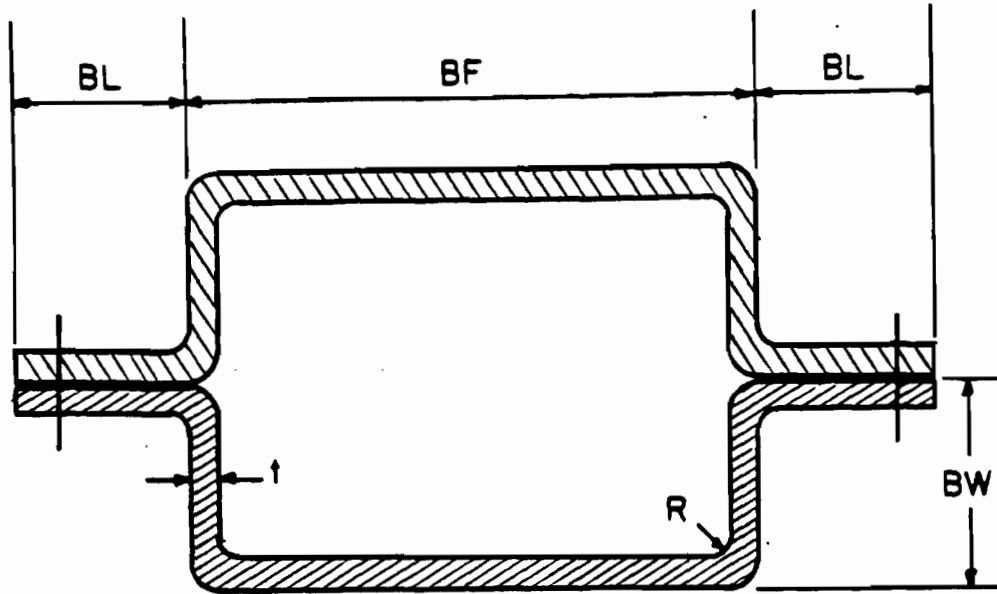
Cross Sections of Box-Shaped Stub Columns
